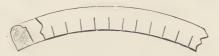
Saw-kerfs in Beading to assist Bending.
